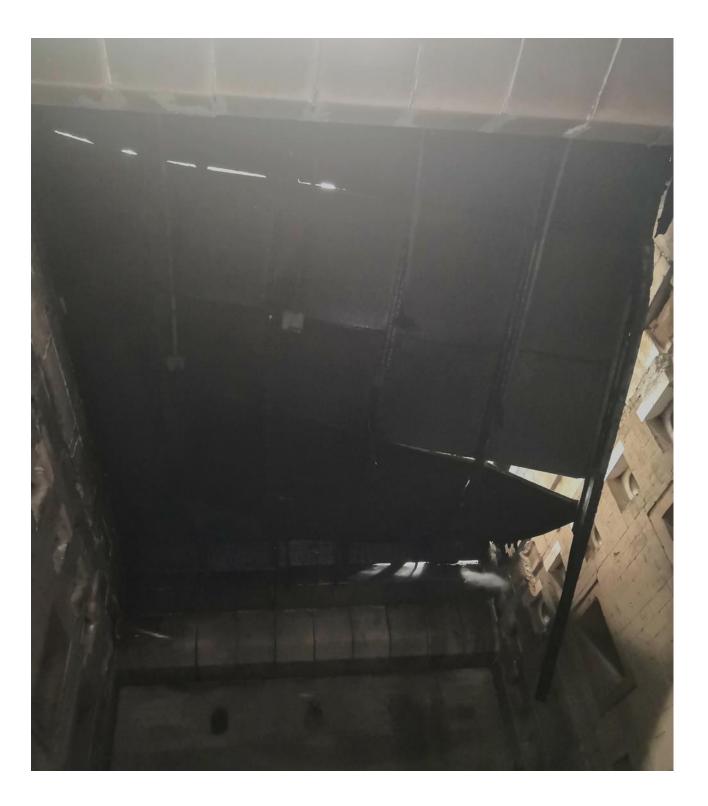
Overall view of the unexposed side of the sample, after the test and cooldown.
